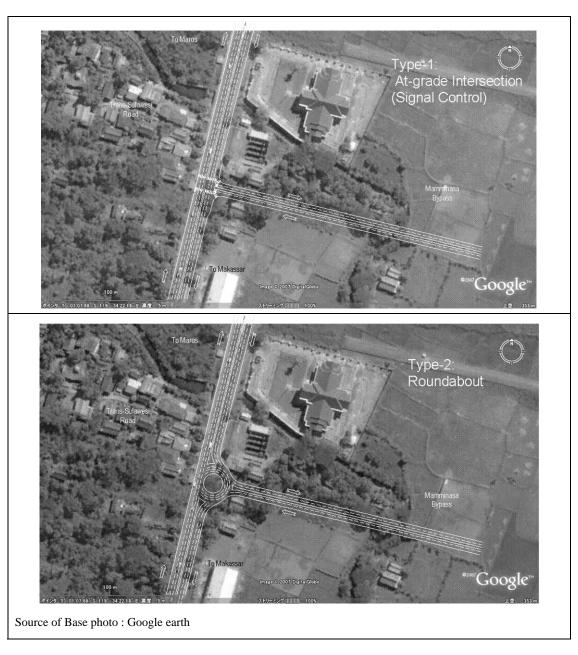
(2) Alternative Intersection Plans for TS-7 IC
